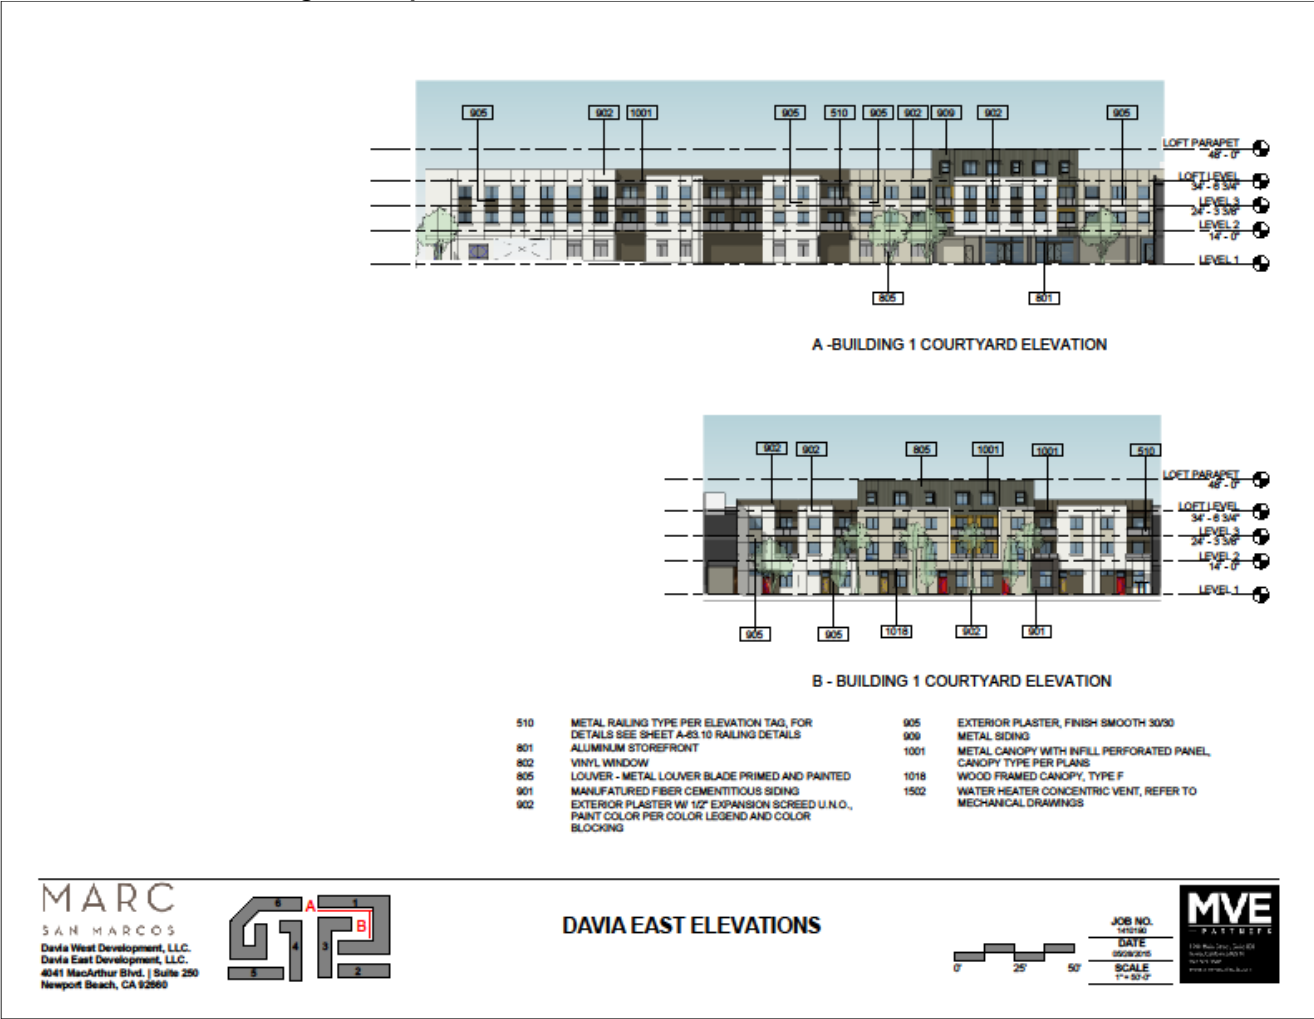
Davia East - Building 1 Courtyard Elevations
